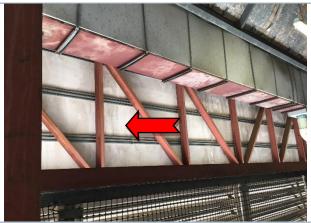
Exterior: level 13, plant room, external walls – suspected asbestos containing fibre cement sheet.
